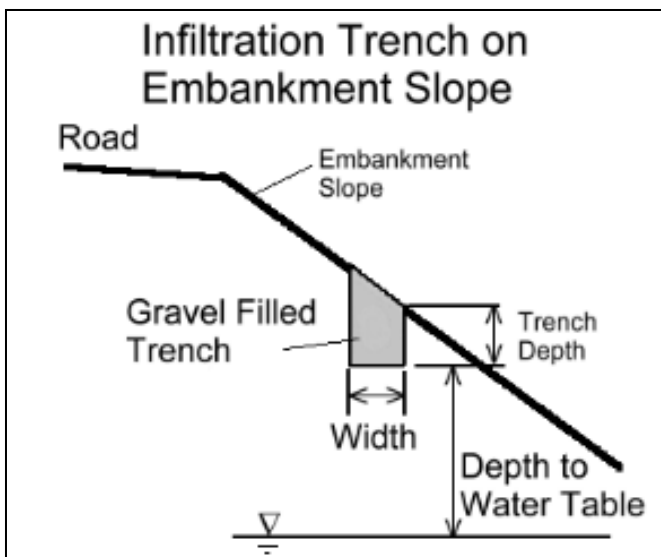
Infiltration Trench Located on Embankment Slope Option
